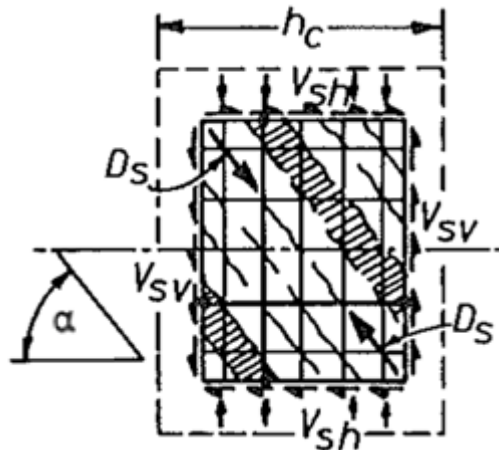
Truss mechanism within monolithic beam-column joint (Paulay & Priestley, 1992)
